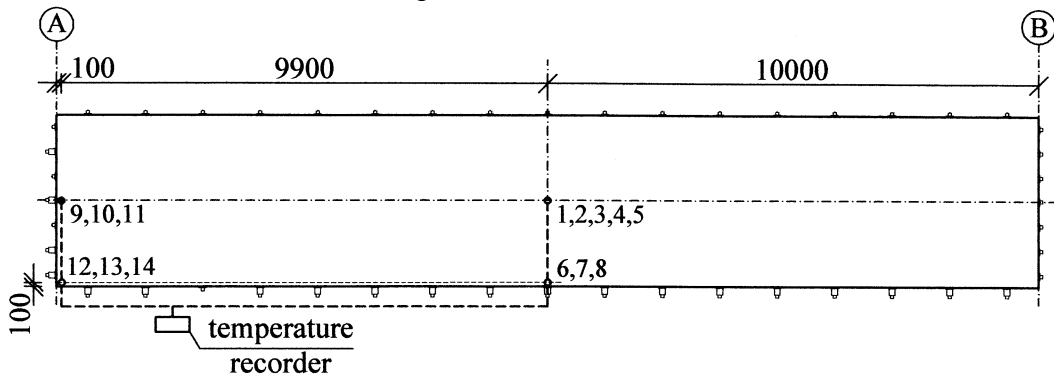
Heat sensors arrangement at the height of prestressed concrete slab.
